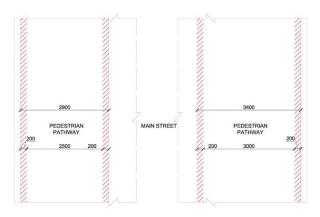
Street width and buffer spaces (in mm) for Gateway 10 in the area surrounding Darmstadt Hauptbahnhof
